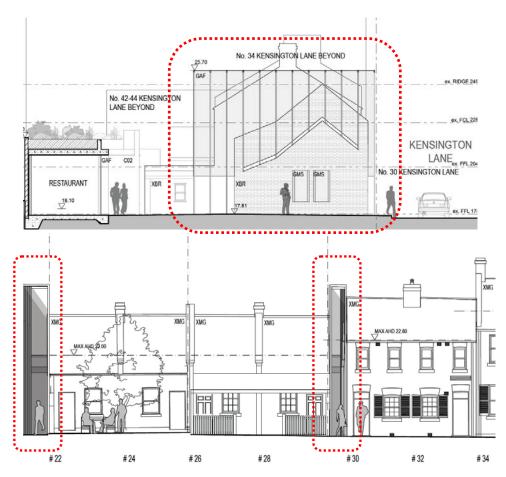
Glazed walkways (elevation and section) proposed between 20-22 and 28-30 Kensington Lane (shown outlined in red)
